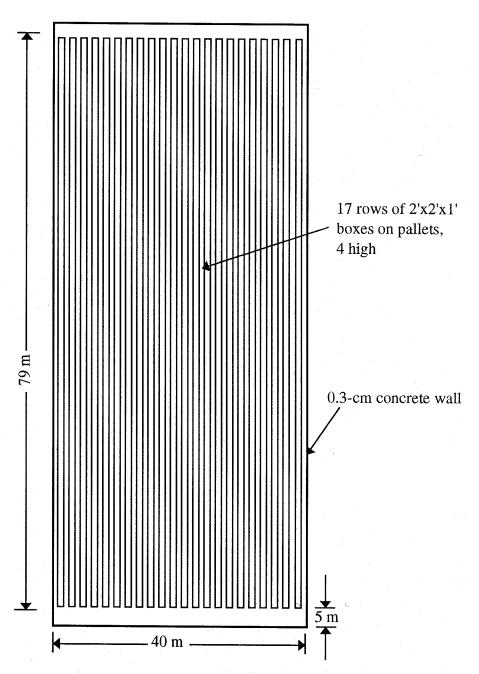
Plan View of a Storage Vault with Storage Configuration
